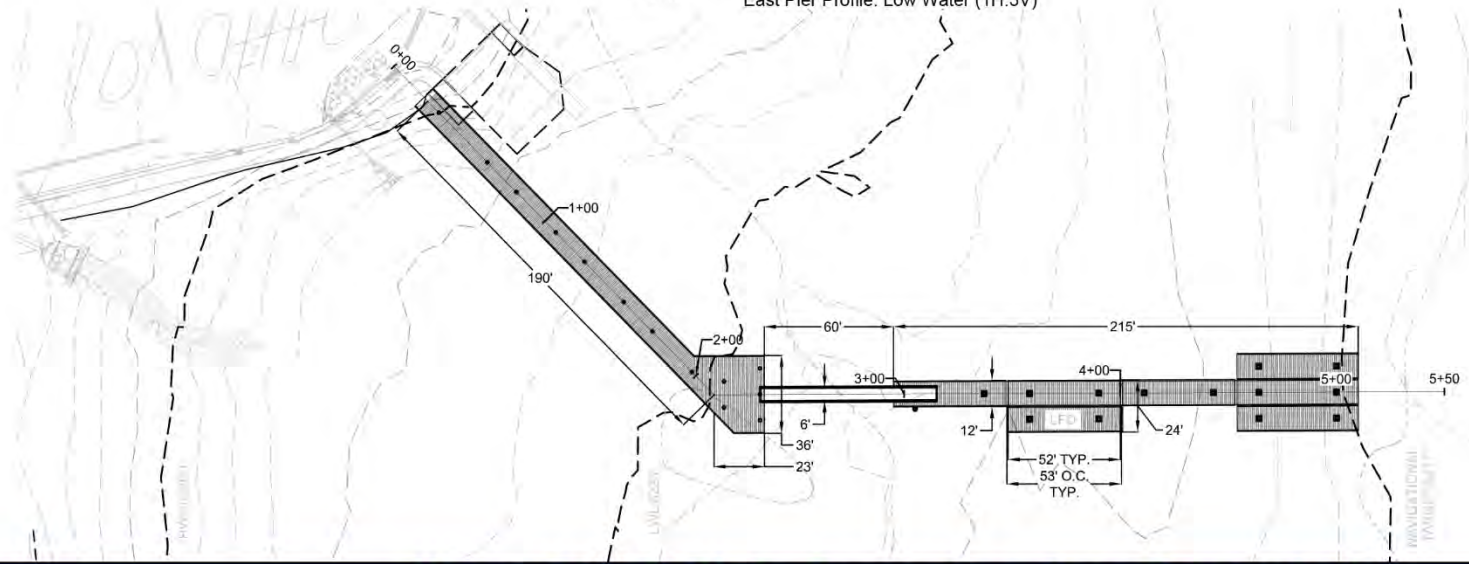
Alternative 2 – Eastern Pier Plan View
